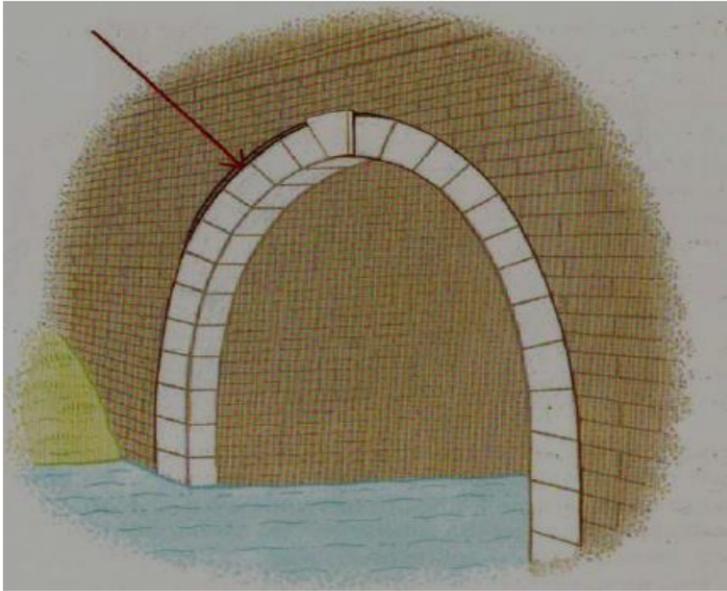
Gap between Spandrel Wall and Arch
